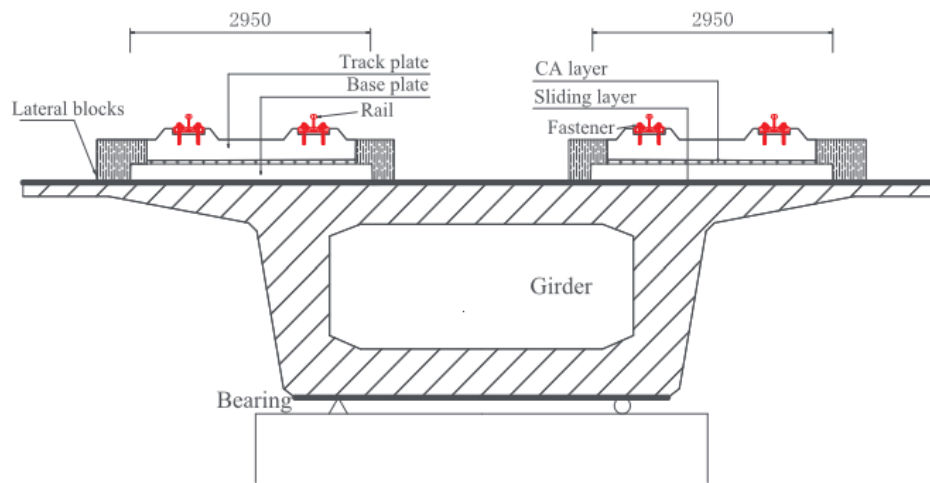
Schematic of typical bridge cross-section of track and girder structure (Li et al. 2020).
